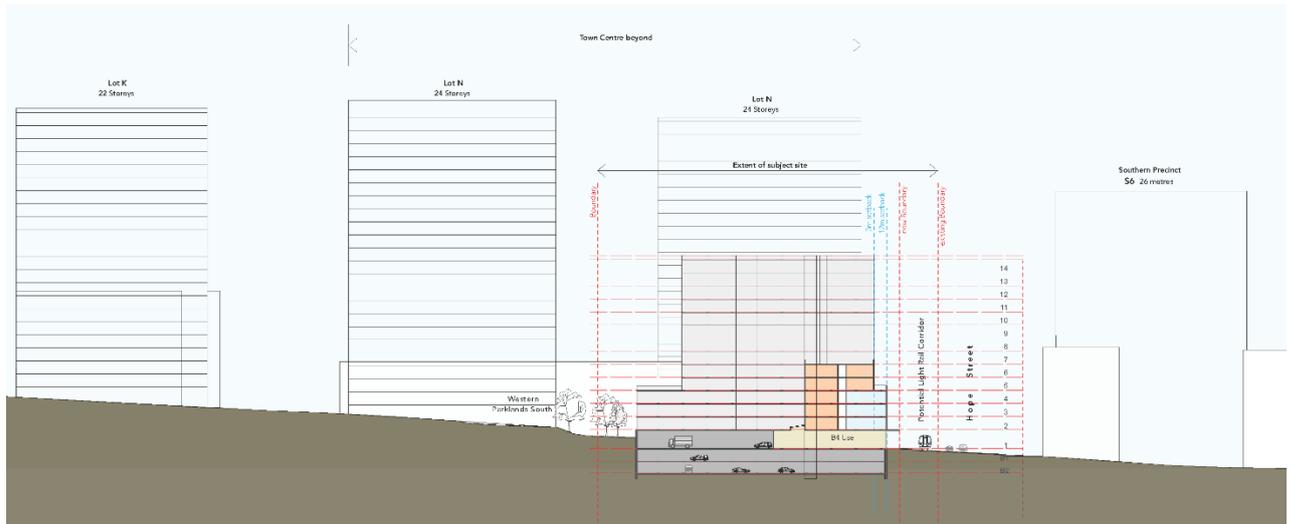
Section through site and Melrose Park North Precinct (Source: Olsson)
